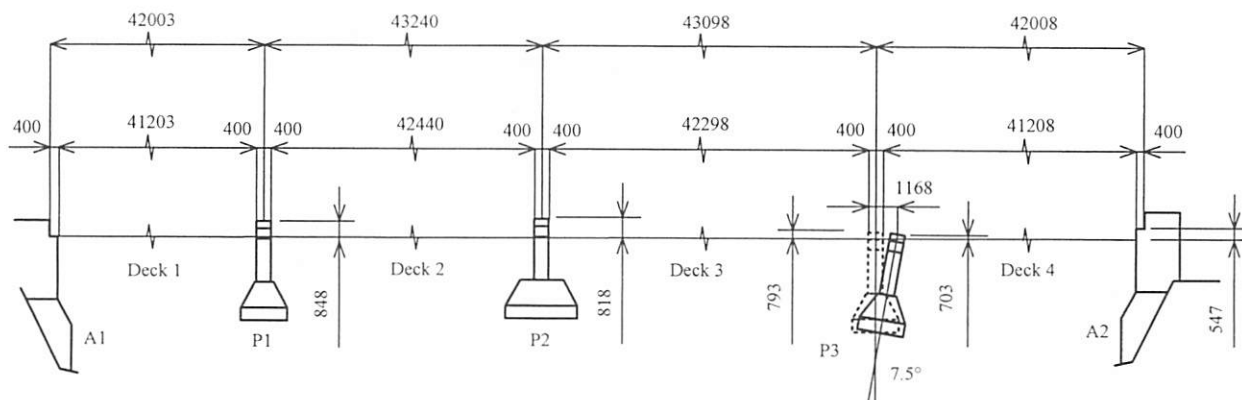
Settlements of Piers & Abutments and Lengths of Spans (unit: mm)
